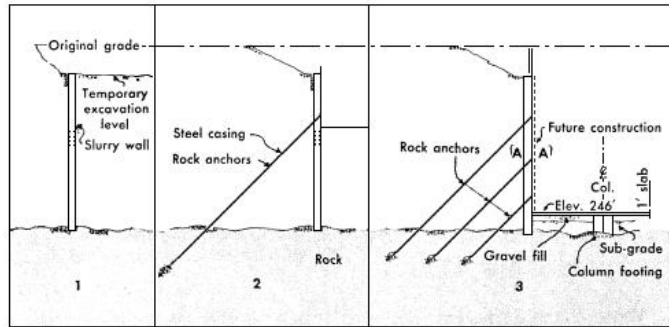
Construction of the Bathtub using the slurry-trench method and steel anchors (9-11 research, z.d.).
